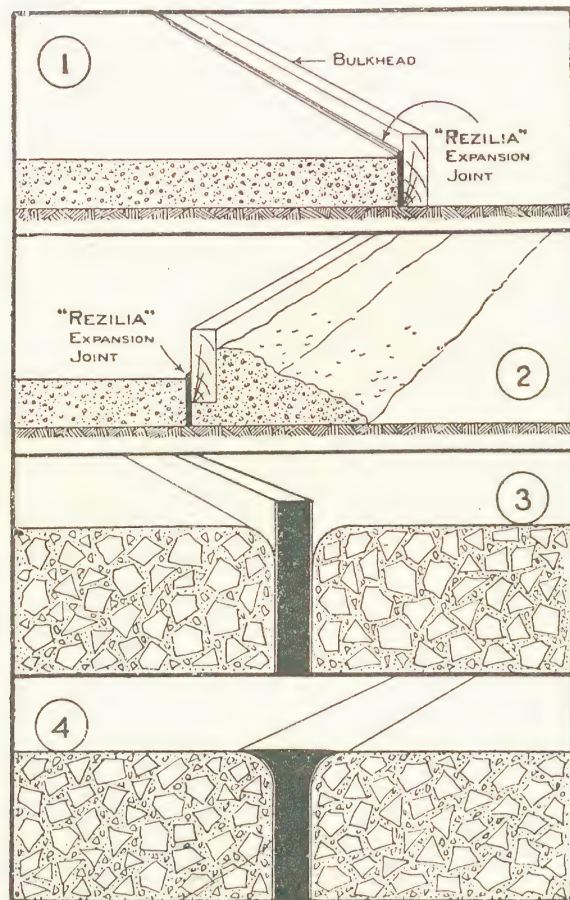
“Rezilia” expansion joint. Stages of installation.
